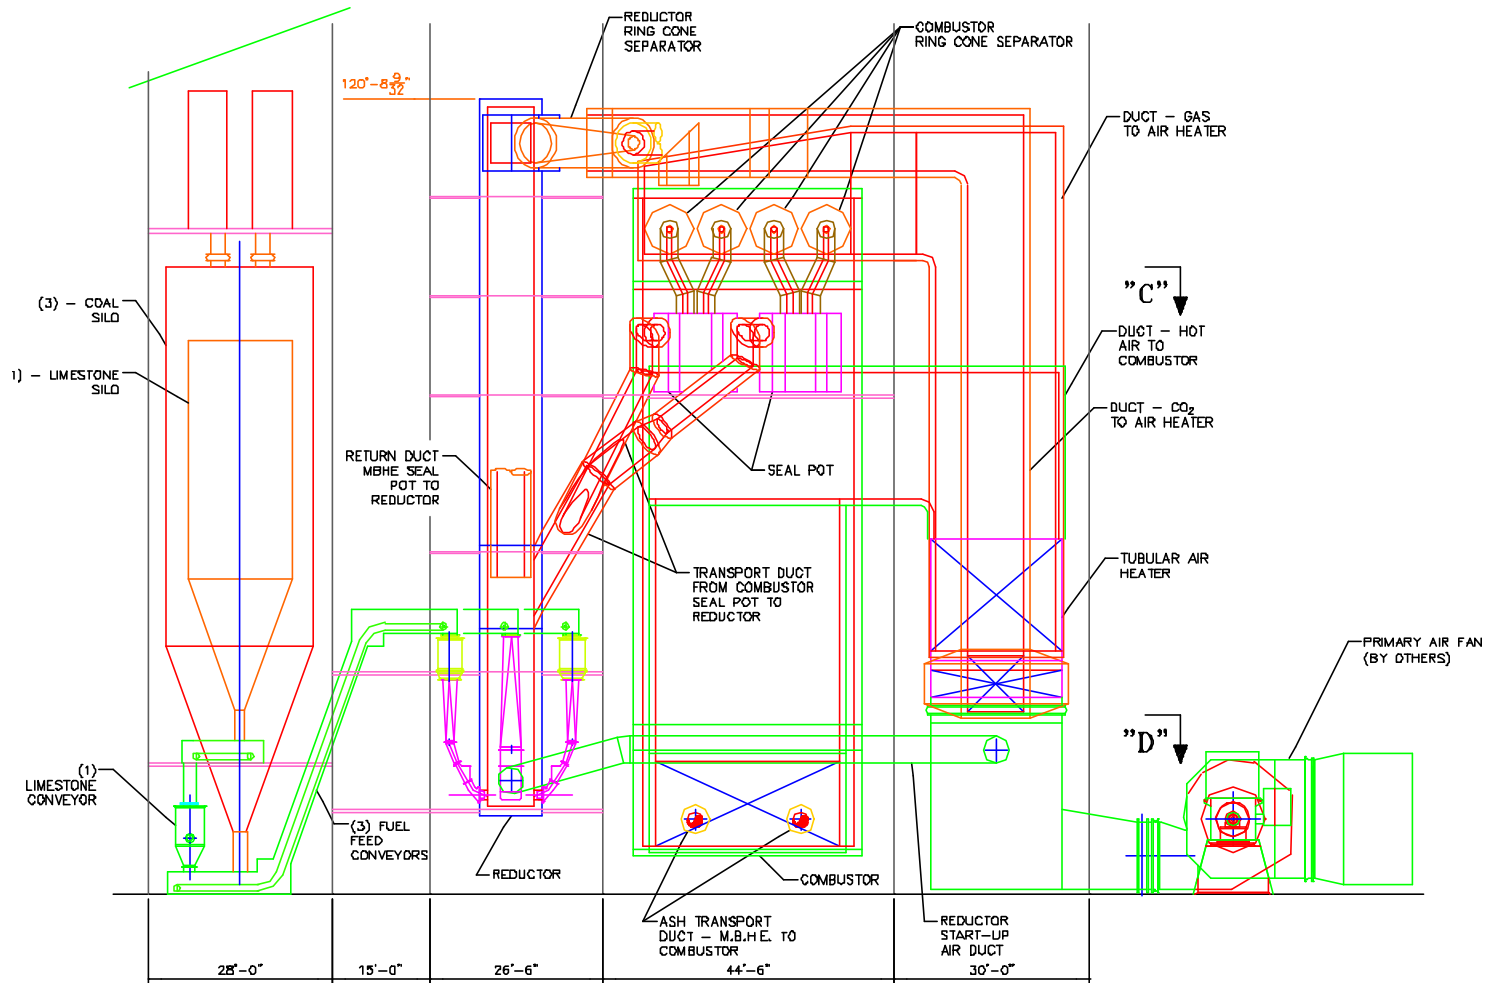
2: Case-7 Boiler Island General Arrangement Drawing – Side Elevation
